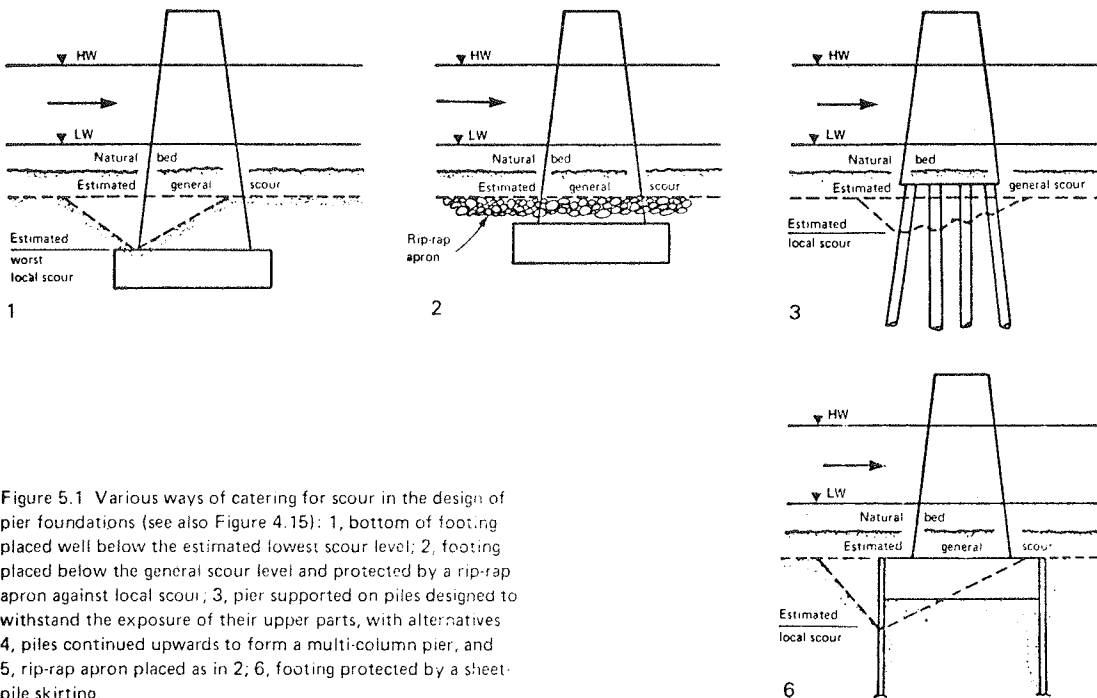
Various ways of catering for scour in the design of pier foundations (see also Figure 4.15): 1, bottom of footing placed well below the estimated lowest scour level; 2, footing placed below the general scour level and protected by a rip-rap apron against local scour; 3, pier supported on piles designed to withstand the exposure of their upper parts, with alternatives 4, piles continued upwards to form a multi-column pier, and 5, rip-rap apron placed as in 2; 6, footing protected by a sheet-pile skirting.
